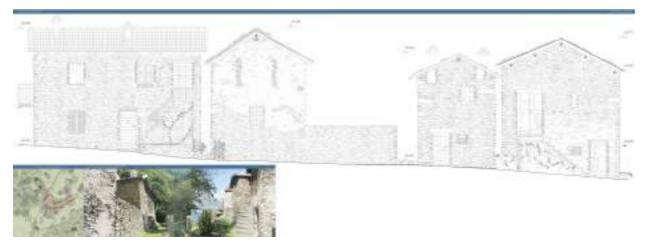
Elevations of two buildings. (source: Corbella, 2014)
